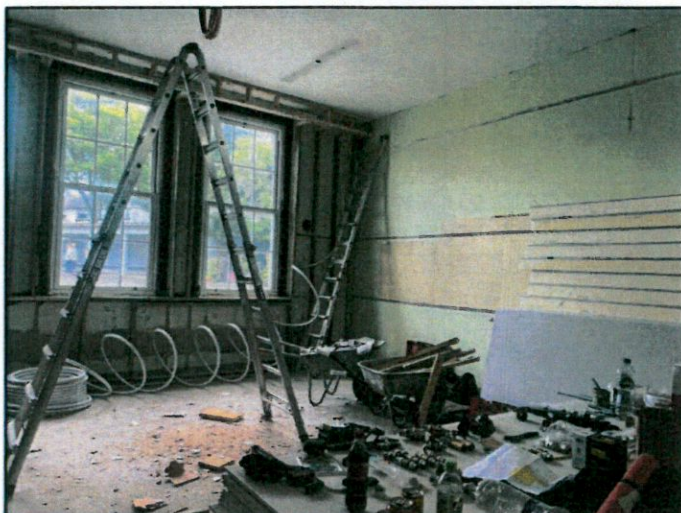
Ongoing works in the building adjacent to the building to be demolished.
